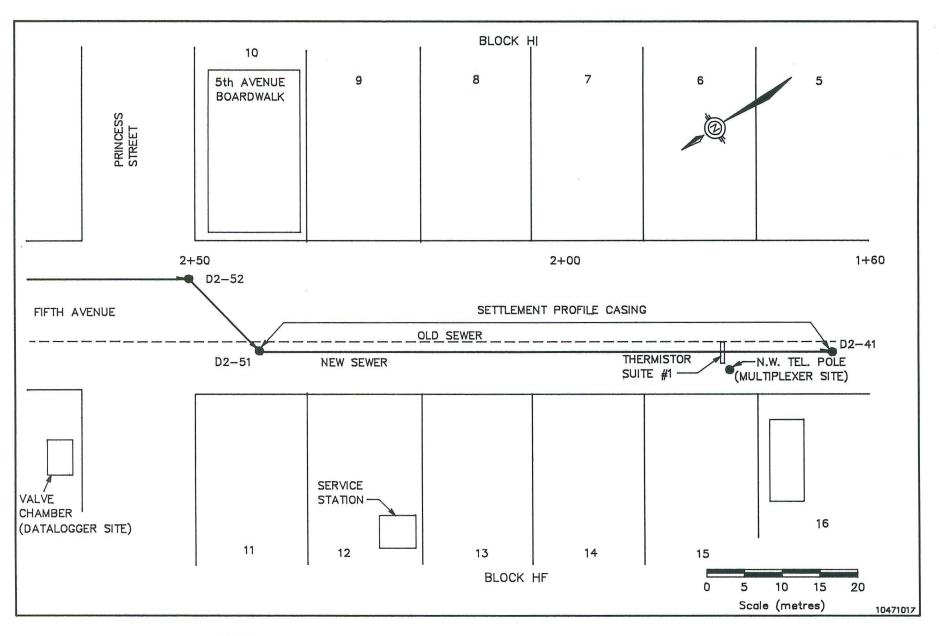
LOCATION PLAN THERMISTOR SUITE #1 AND SETTLEMENT PROFILE CASING FIFTH AVENUE AT BLOCK HF
